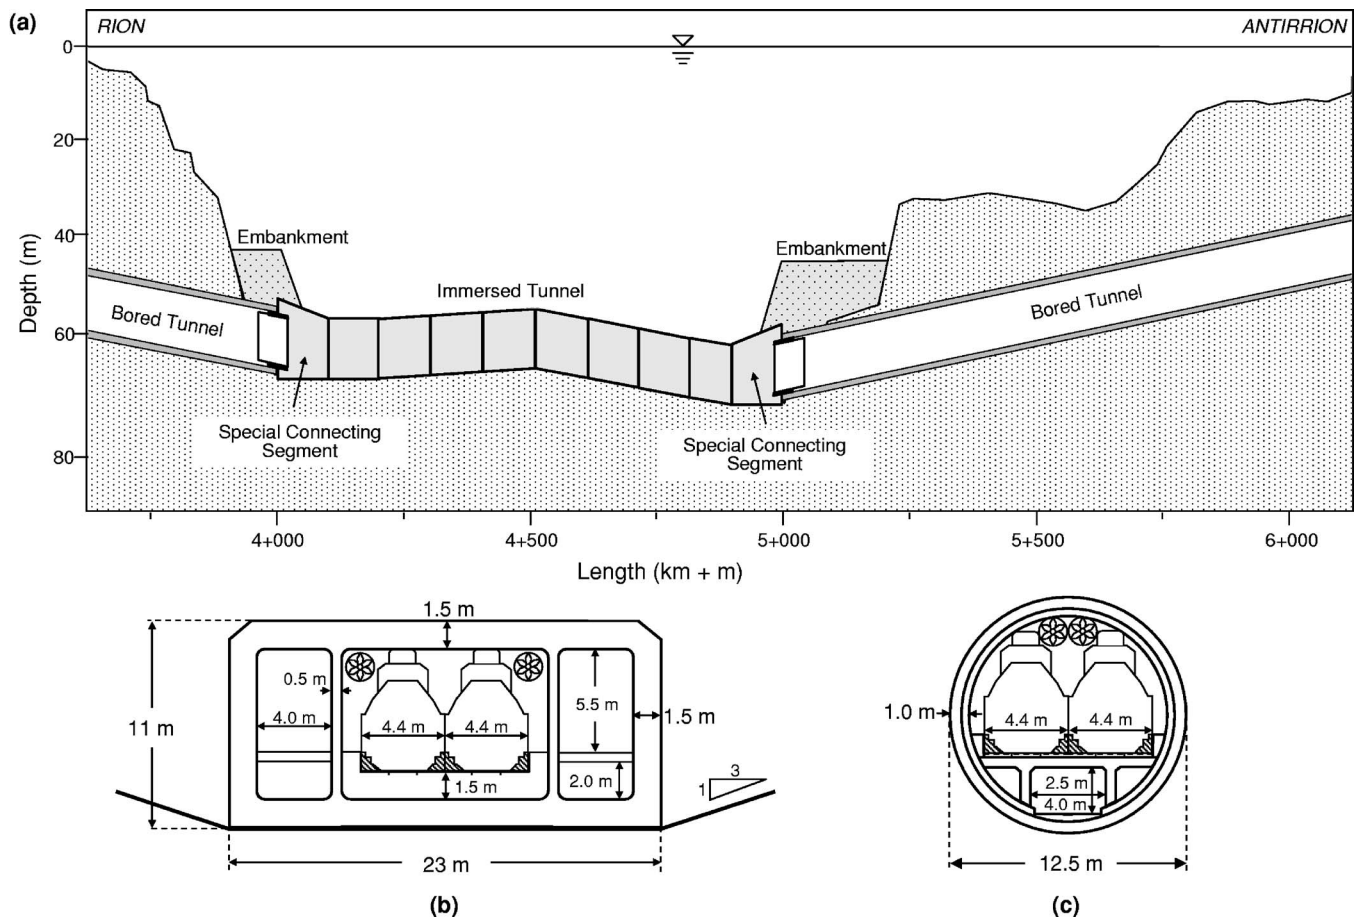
(a) Longitudinal section of the proposed tunnel; (b) immersed tunnel cross section; and (c) bored tunnel cross section
